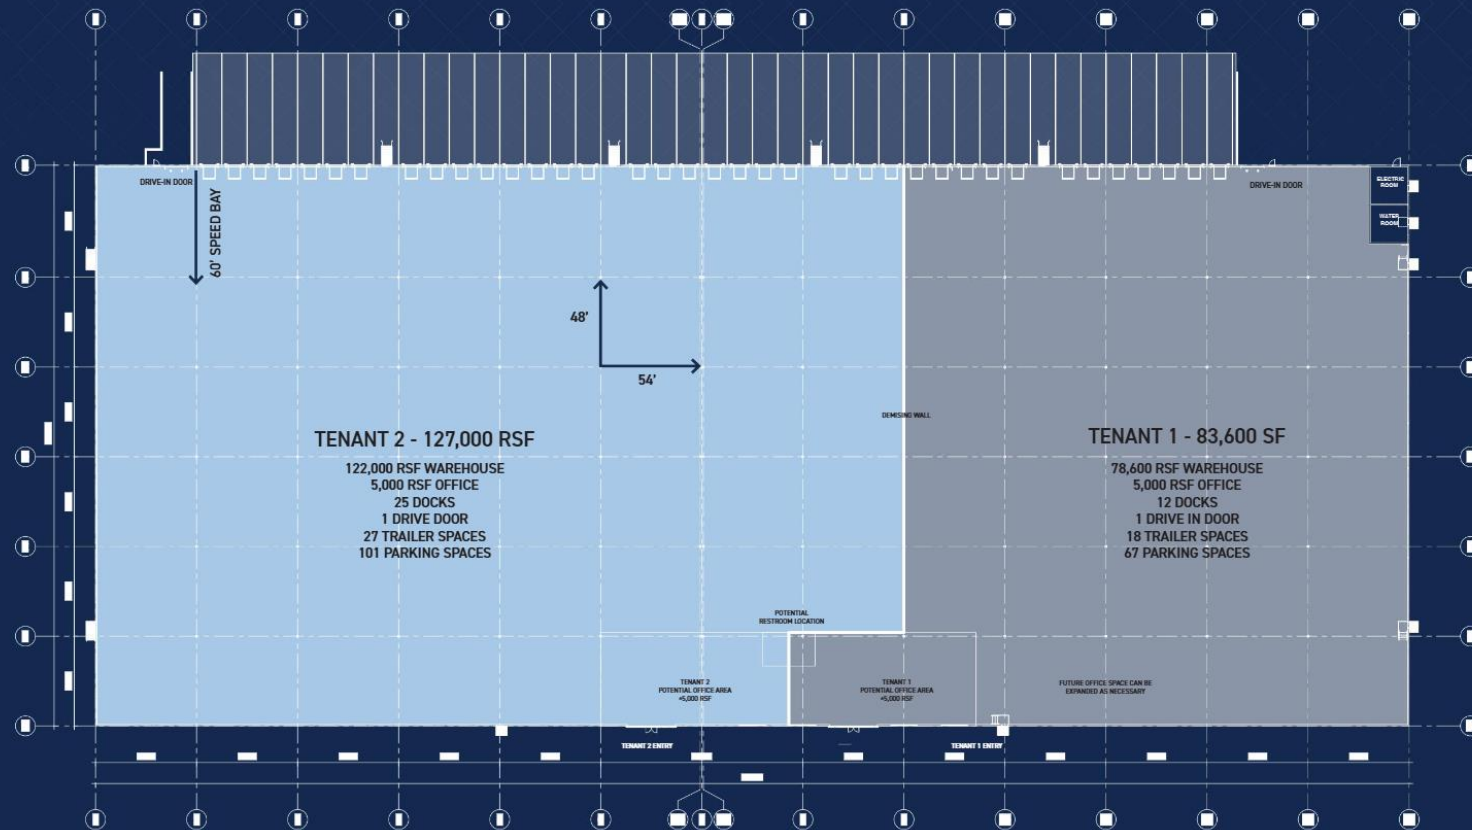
Possible Multi-Tenant Building Plan (the Electrical Room is located in the upper right corner) - 586 Manley Street [National Development]
